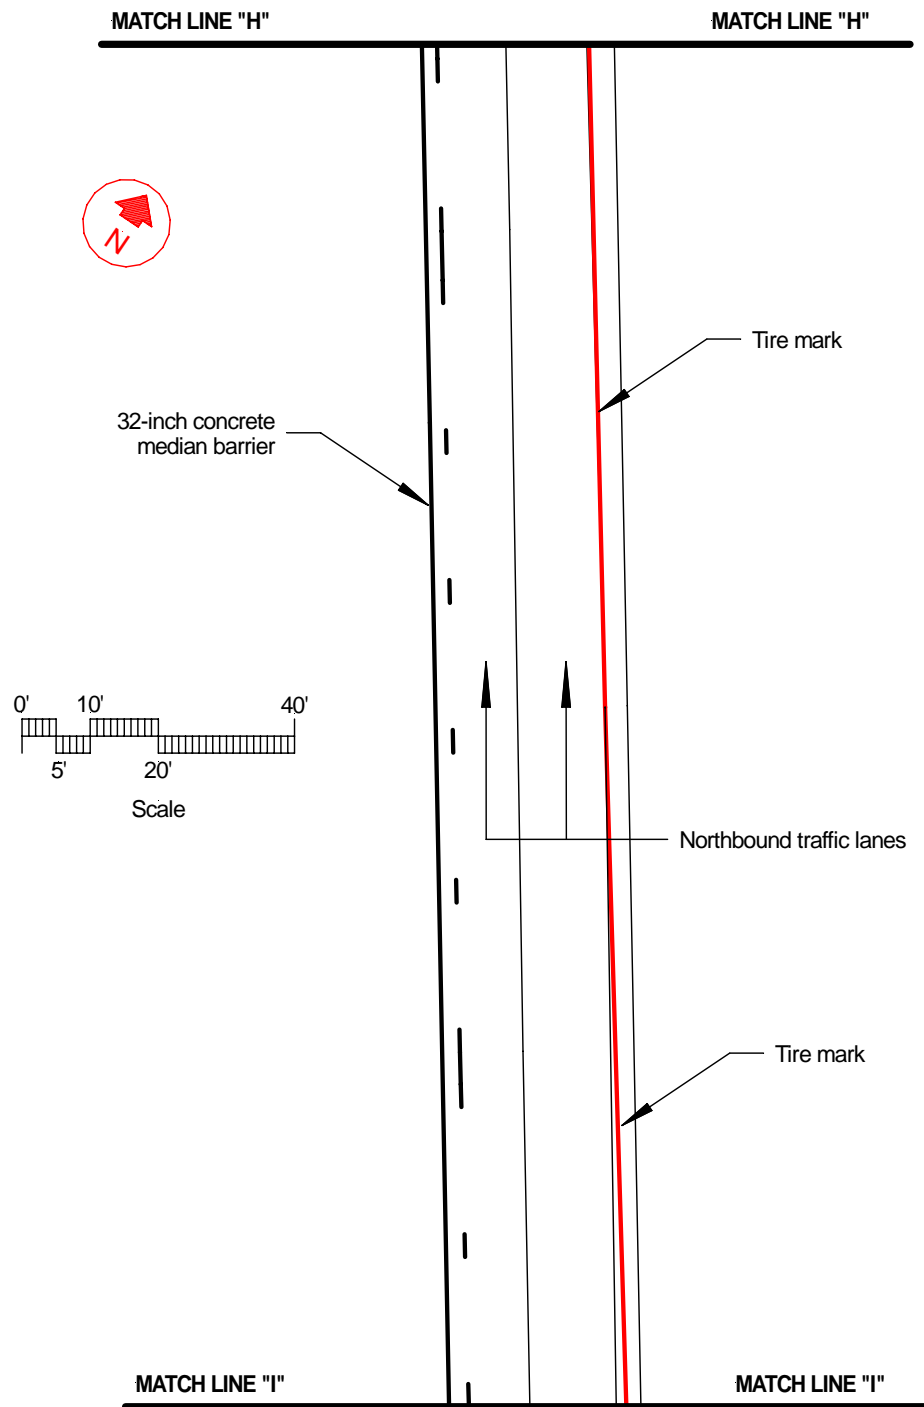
NTSB map of H-I pavement markings and roadway evidence.
